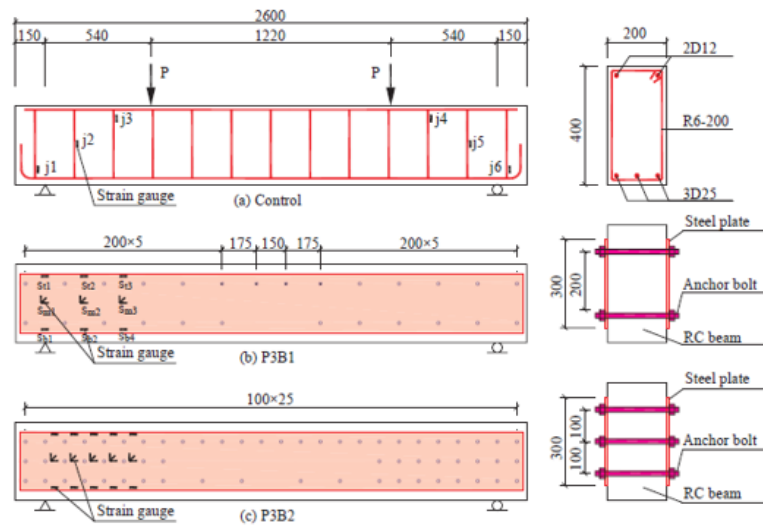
BSP Beams Detailing (Li, et al., 2018).
